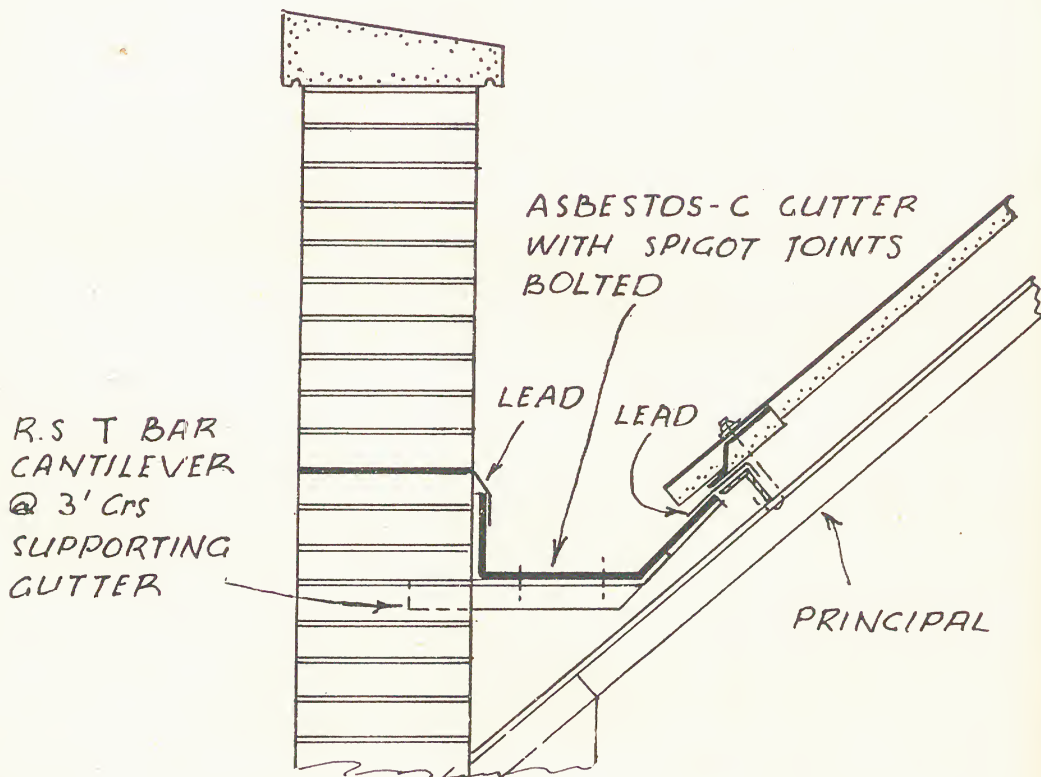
Asbestos-cement gutter behind parapet wall.
